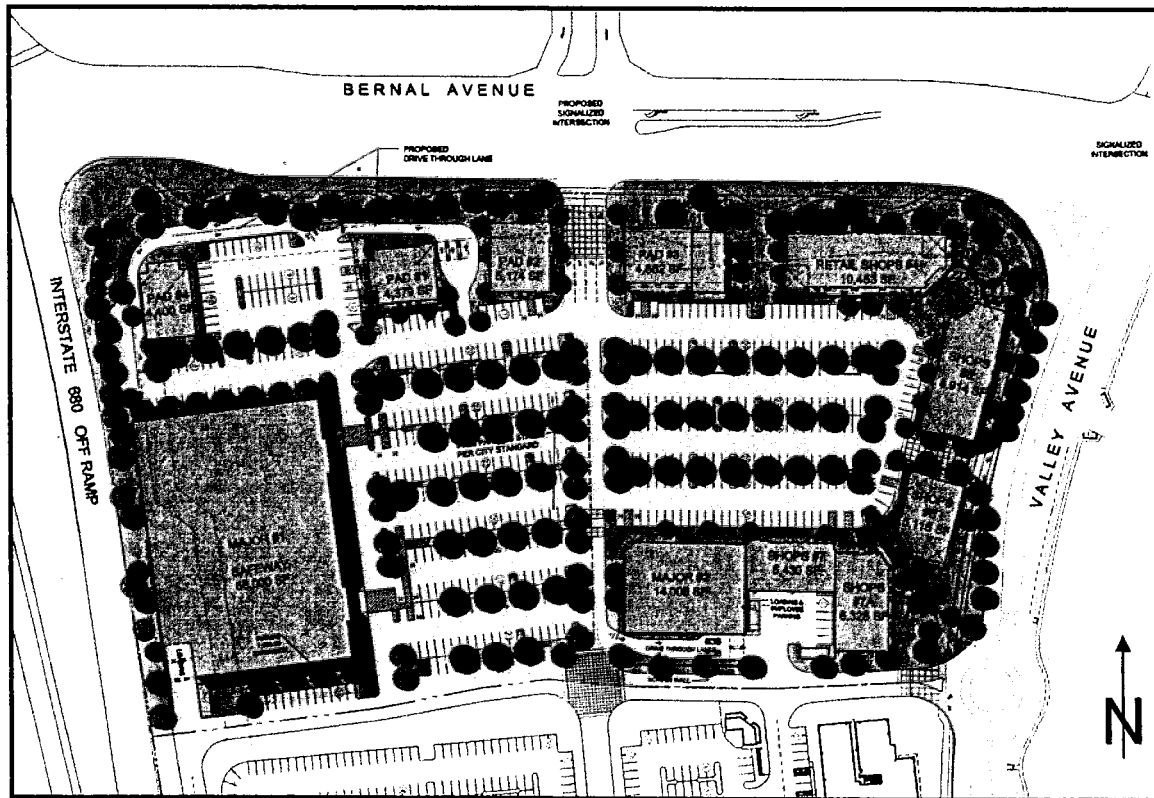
, below, is the overall site plan for the Pleasanton Gateway development.
